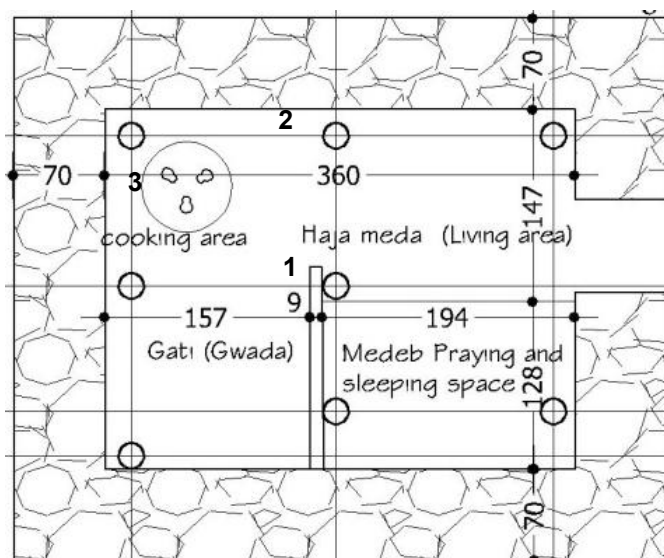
262 Plan of Wro Sofiya Aliyu's house
